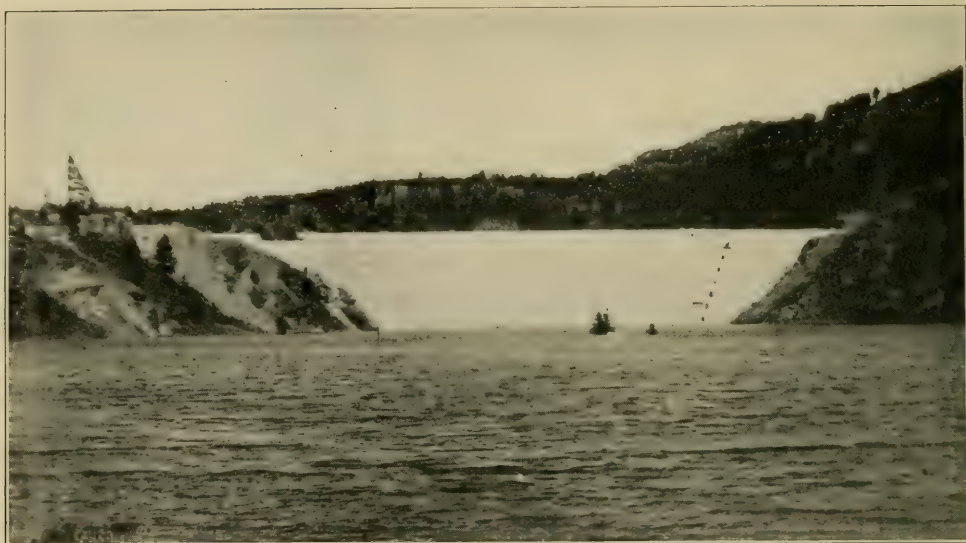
LAKE IN BOULDER CANYON, COL., HELD BACK BY THE IMMENSE CONCRETE DAM.
